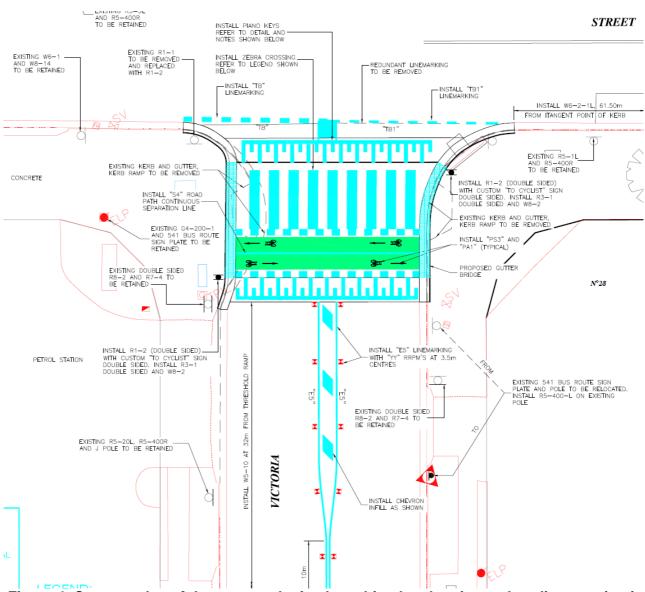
Concept plan of the proposed raised combined pedestrian and cyclist crossing in Victoria Street south of Bridge Street, Epping
